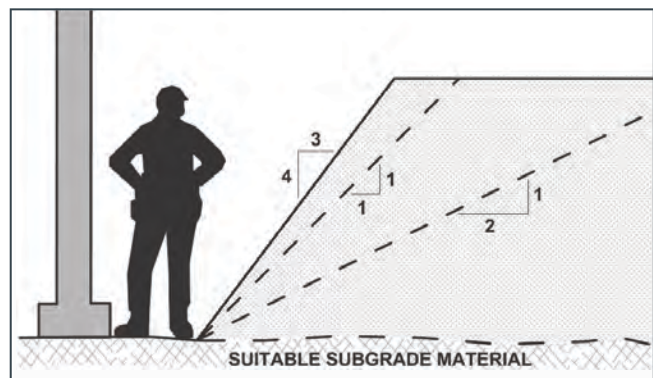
Examples of possible temporary excavation slope angles at an example site; recommendations would be provided on site by a Professional Geotechnical Engineer based on actual site conditions.
